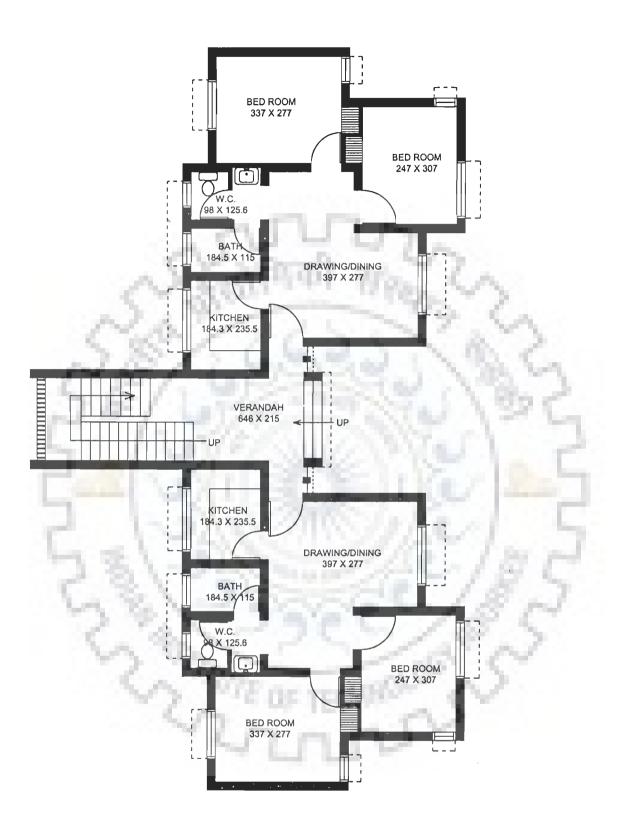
(a) - Ground Floor Plan of Project No. 11 (Total Plinth Area = 237.00 sqm; Total Floor Area = 208.50 sqm)
